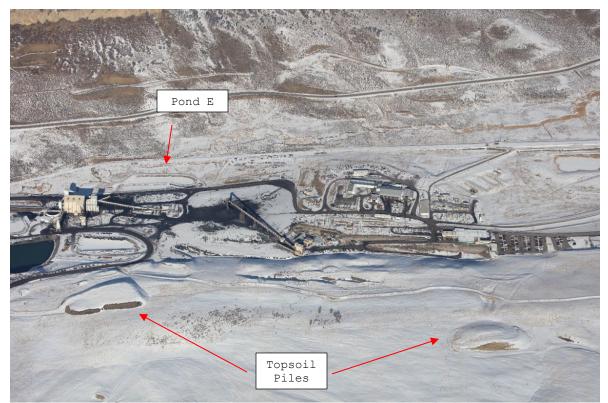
Overview of the main facilities area including the main ROM stockpile area and stoker coal loadout building, 2 topsoil stockpiles and Pond E are also visible.
